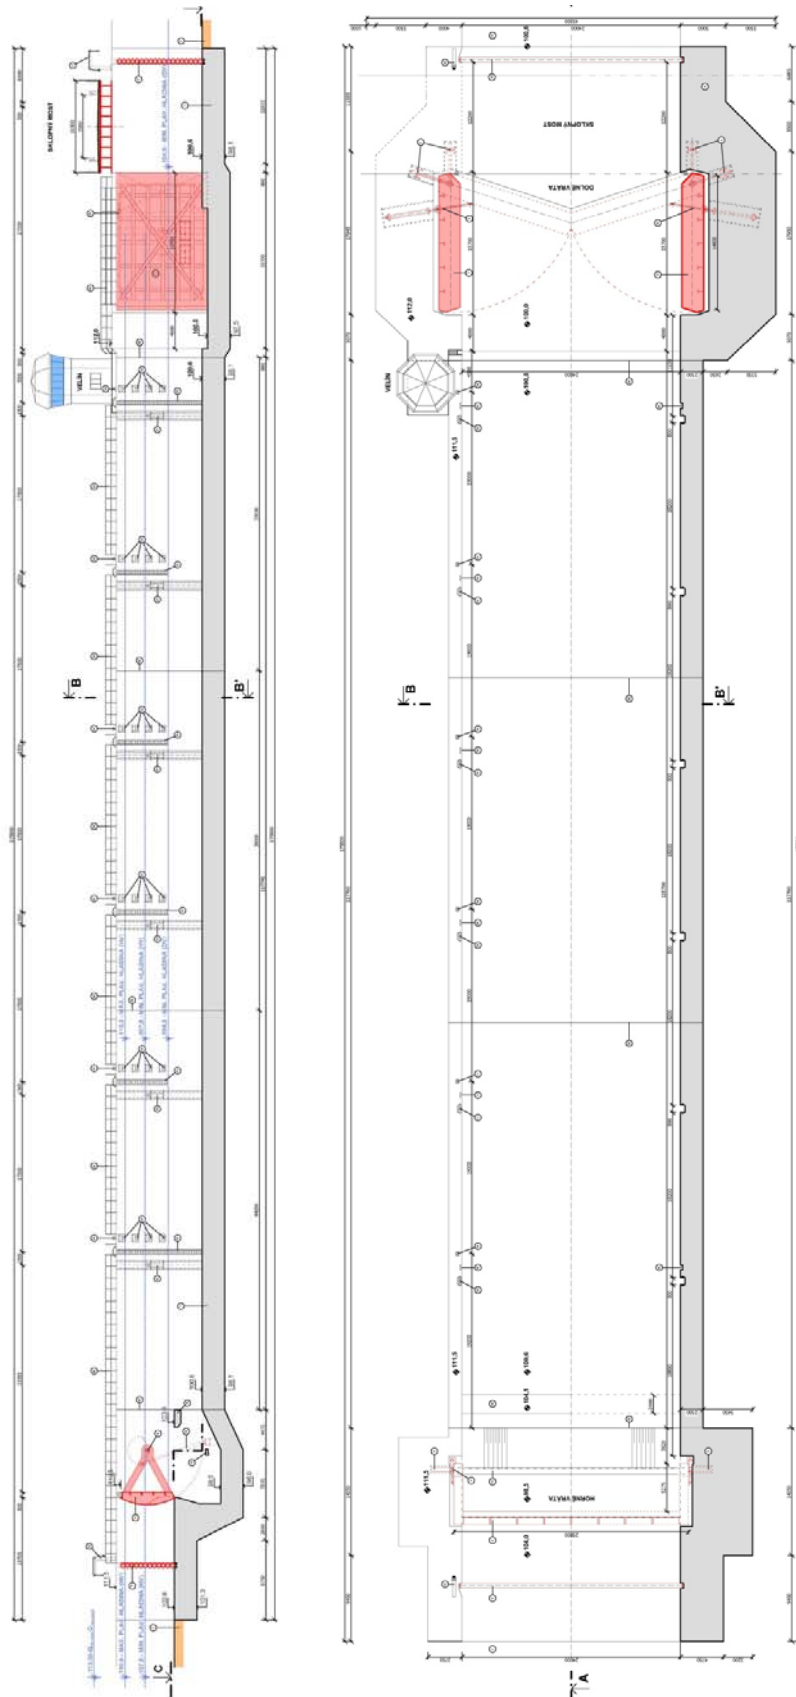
Kolárovo Water structure - The plan and section of ship lock (variant 1) [1]
